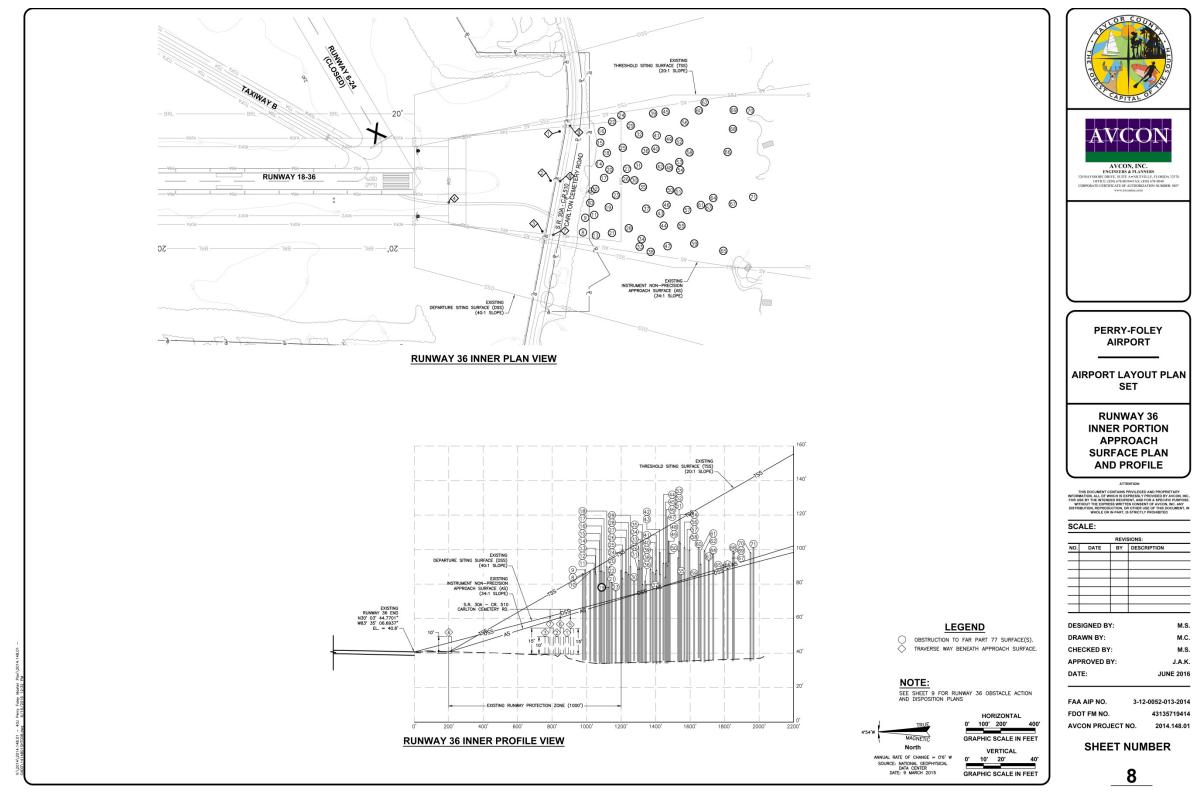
RUNWAY 36 INNER PORTION APPROACH SURFACE PLAN AND PROFILE
